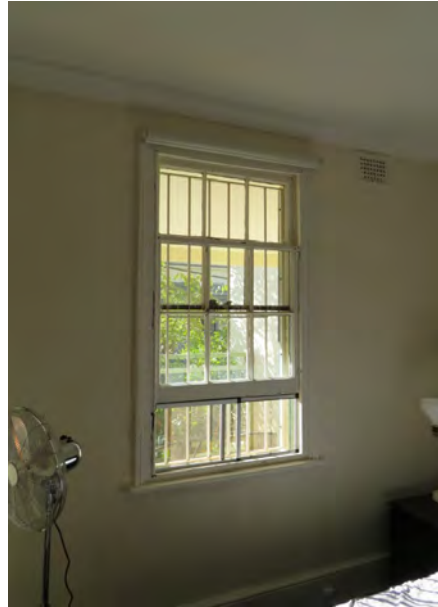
Front first floor room in 98 Brougham Street showing later cornices and original skirtings.
